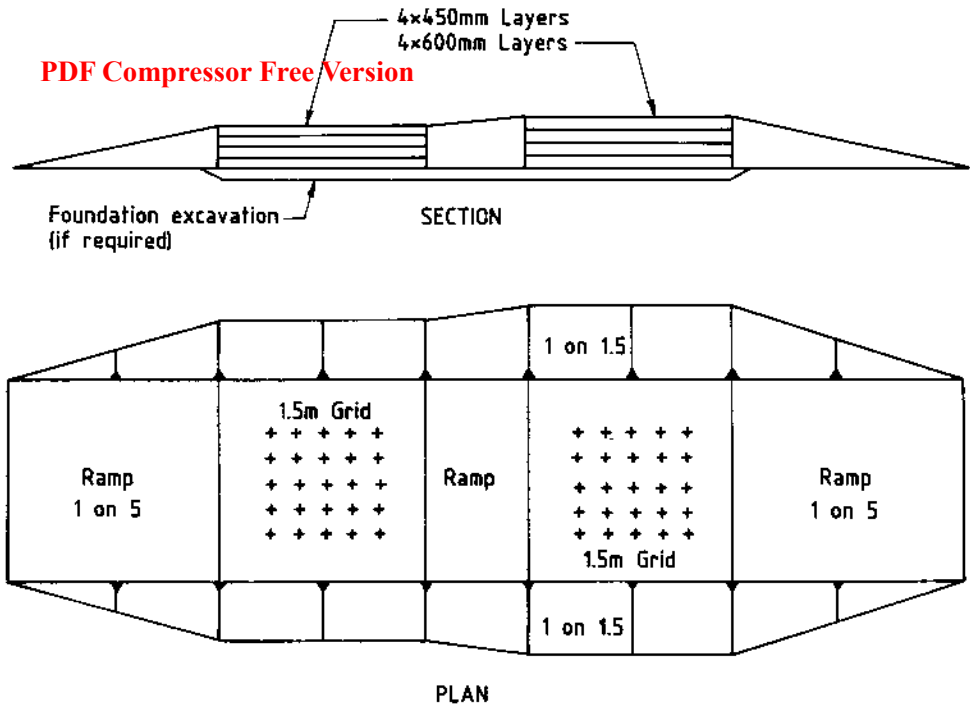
Layout of rockfill roller trial (Bertram 1972). Reprinted by permission of John Wiley & Sons Inc.
